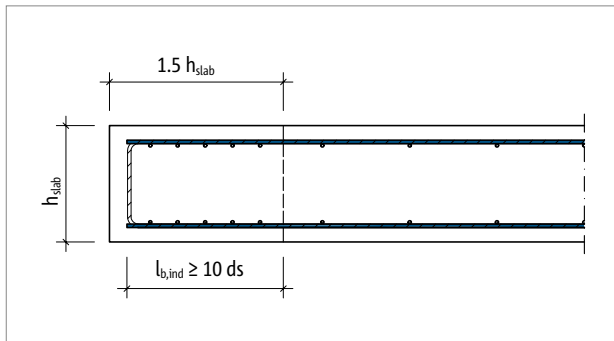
Anchorage of the upper and lower reinforcement at the edge of the slab
